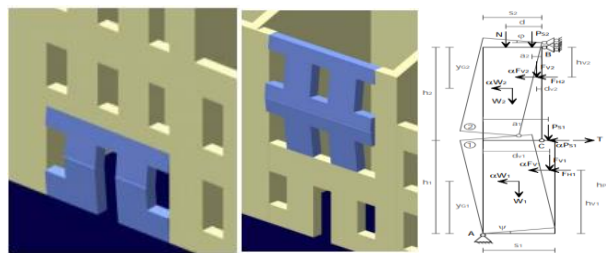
Vertical wall out-of-plane failure mechanism [112]
